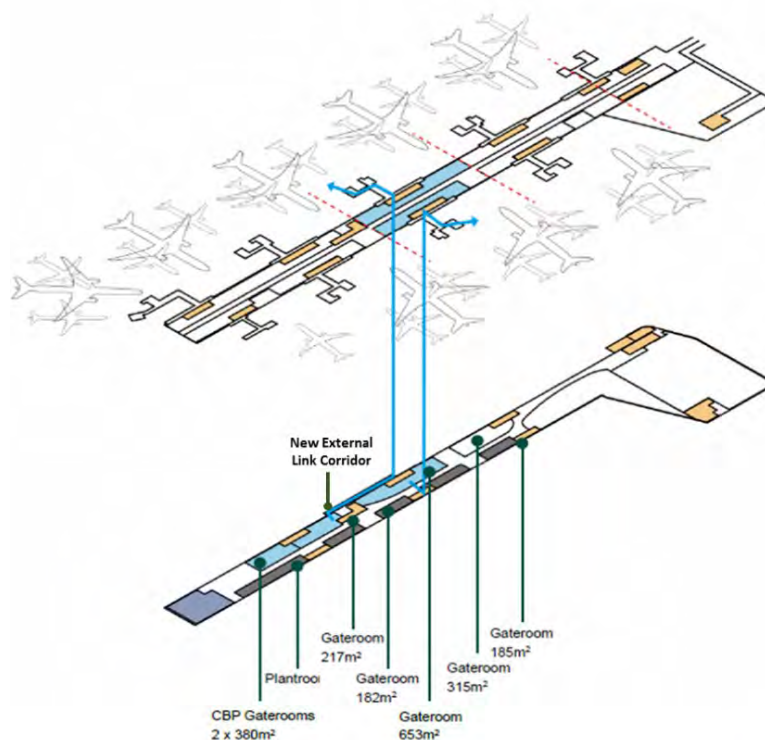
Axonometric view of Pier 4 Apron and First floor
